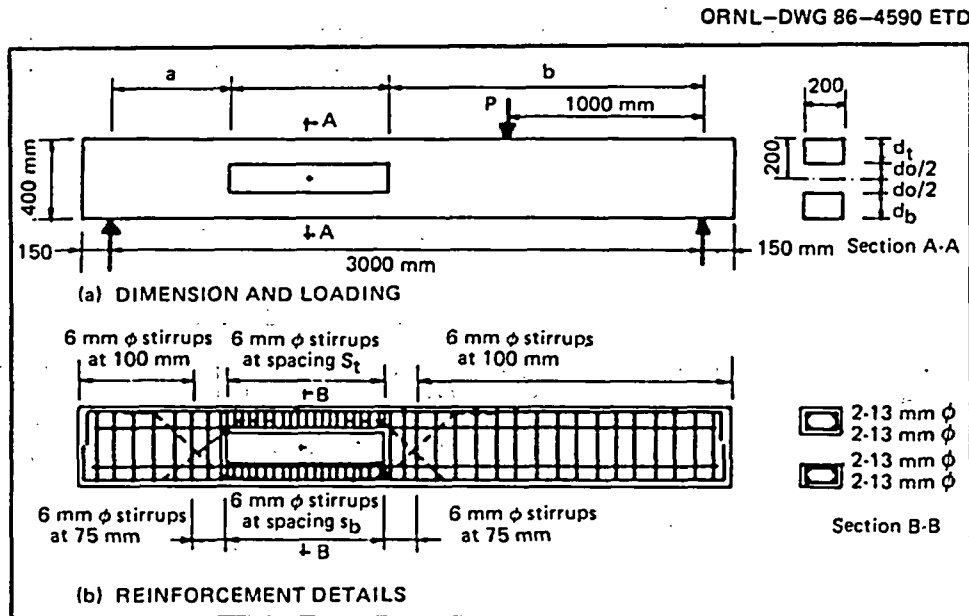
Dimensions, loadings, and reinforcement details of reinforced concrete beams containing a large rectangular opening. Source: M. A. Mansur and K. C. G. Ong, "Epoxy-Repaired Beams," *Concr. Int'l.* 7(10), American Concrete Institute, Detroit, October 1985.
